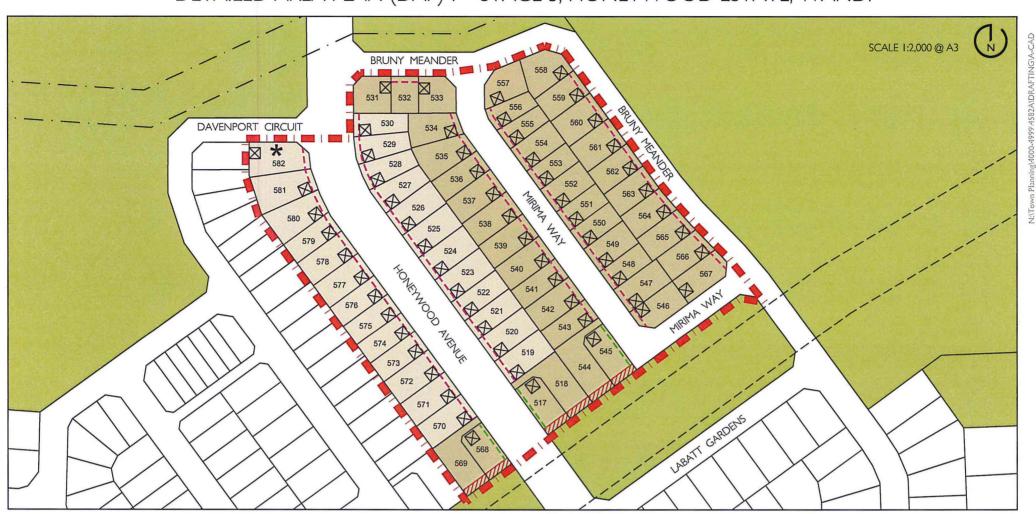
# DETAILED AREA PLAN (DAP) 7 - STAGE 3, HONEYWOOD ESTATE, WANDI
